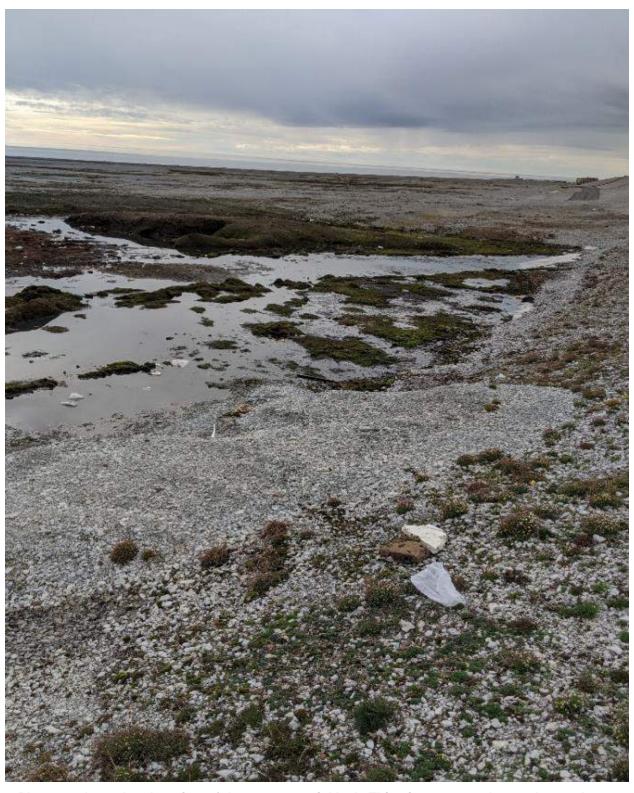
Damaged existing liner at the top of the embankment, north discharge station.
